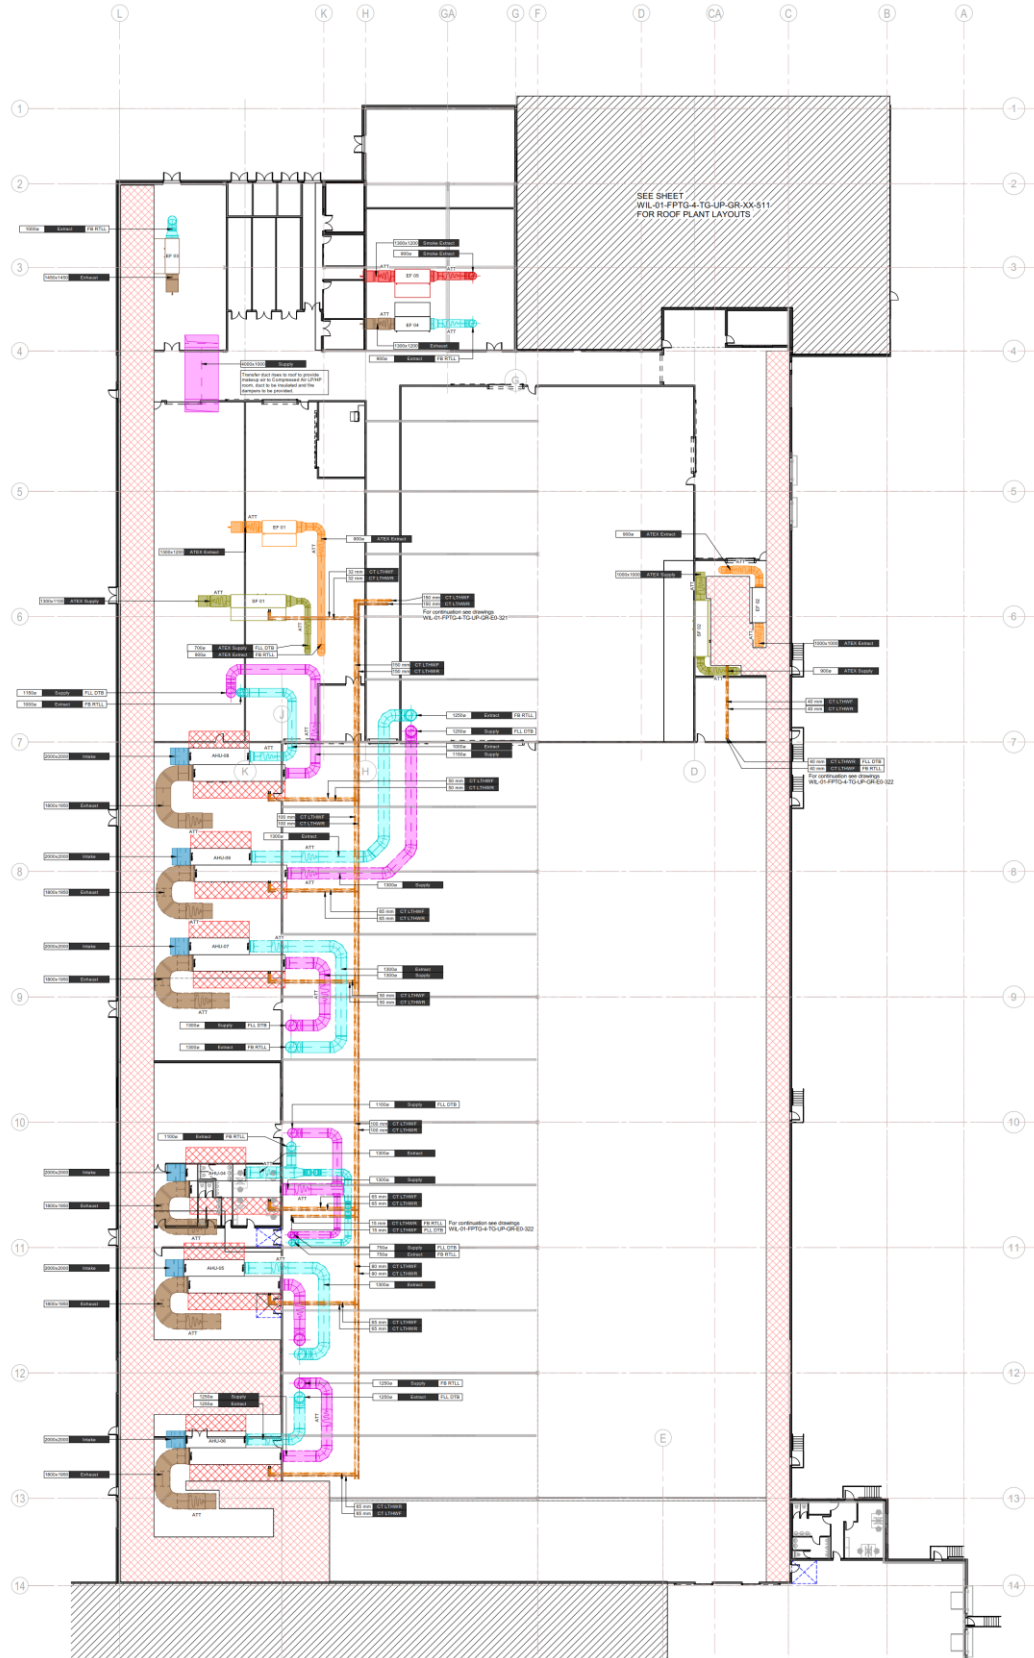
Proposed roof plant above Office Area (North Eastern Corner) – Phase 1 (AHU units) (1/3)
